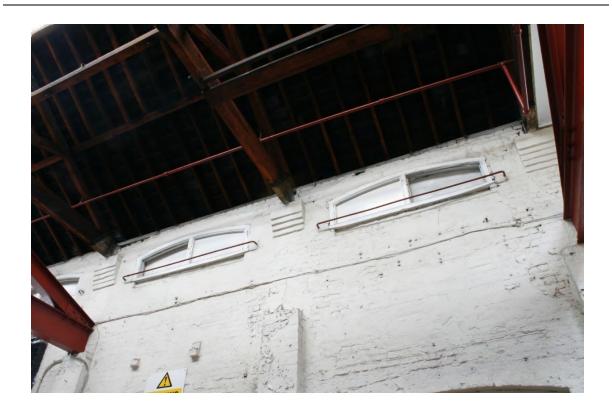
Internal view of blocked transom windows in the north-east elevation, looking north-east (72FmLa D100 017)
